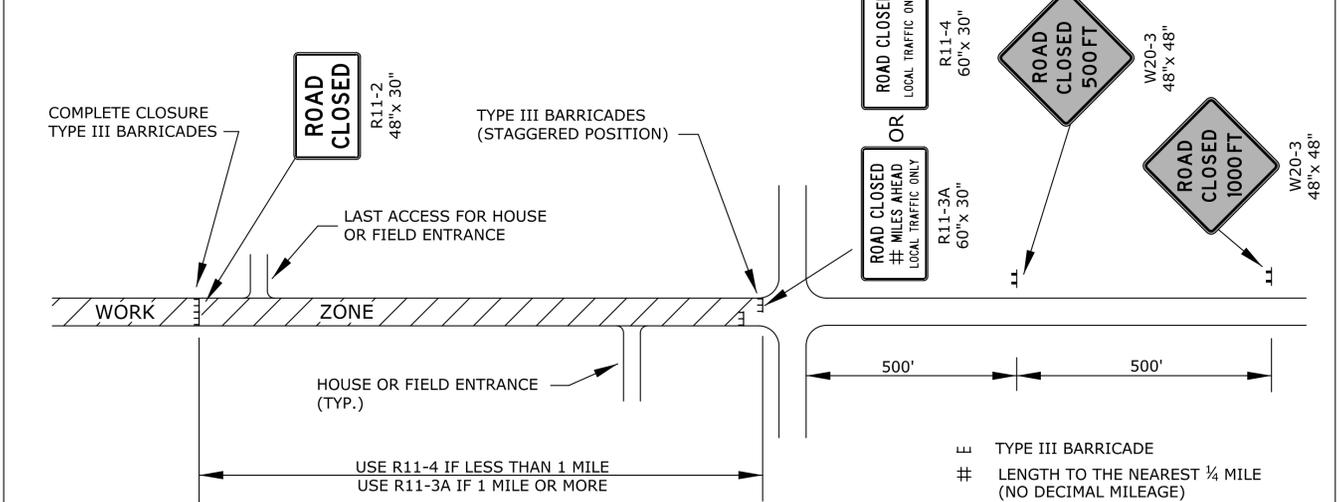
TYPICAL SIGNING FOR ROAD CLOSURE - LOCAL TRAFFIC ACCESS
